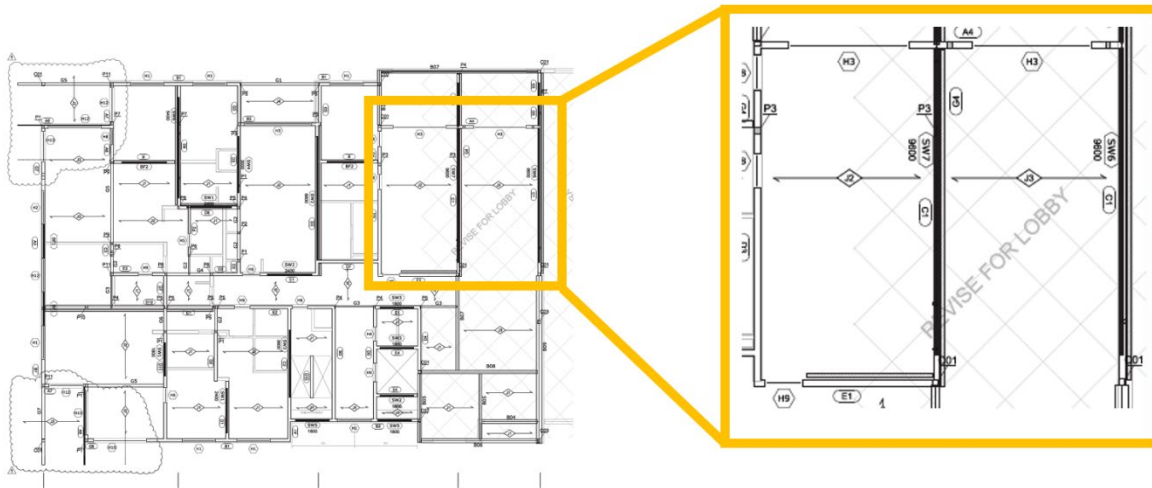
Selected Portion of the Ground Floor Plan provided by BlueScope
